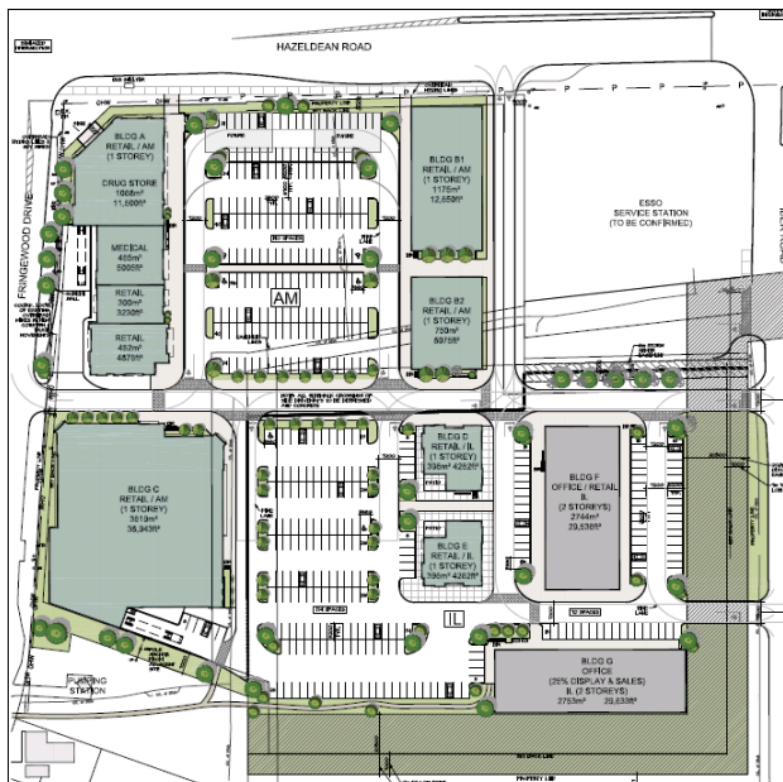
Commercial under construction on the south east corner of Fringewood Drive and Hazeldean Road
